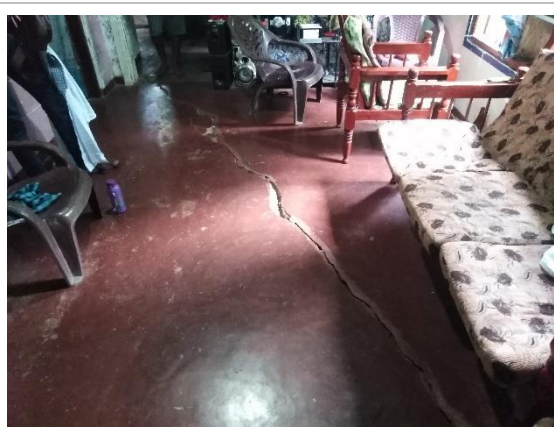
Cracks in the walls of the house of R.D. Pradeep Roshan -a high-risk house
